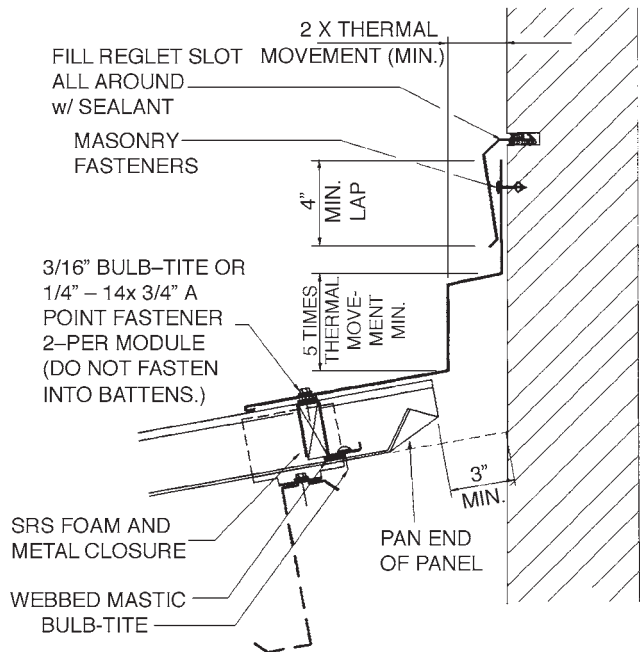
Section through parapet at high-side wall. (A&S Building Systems.)
